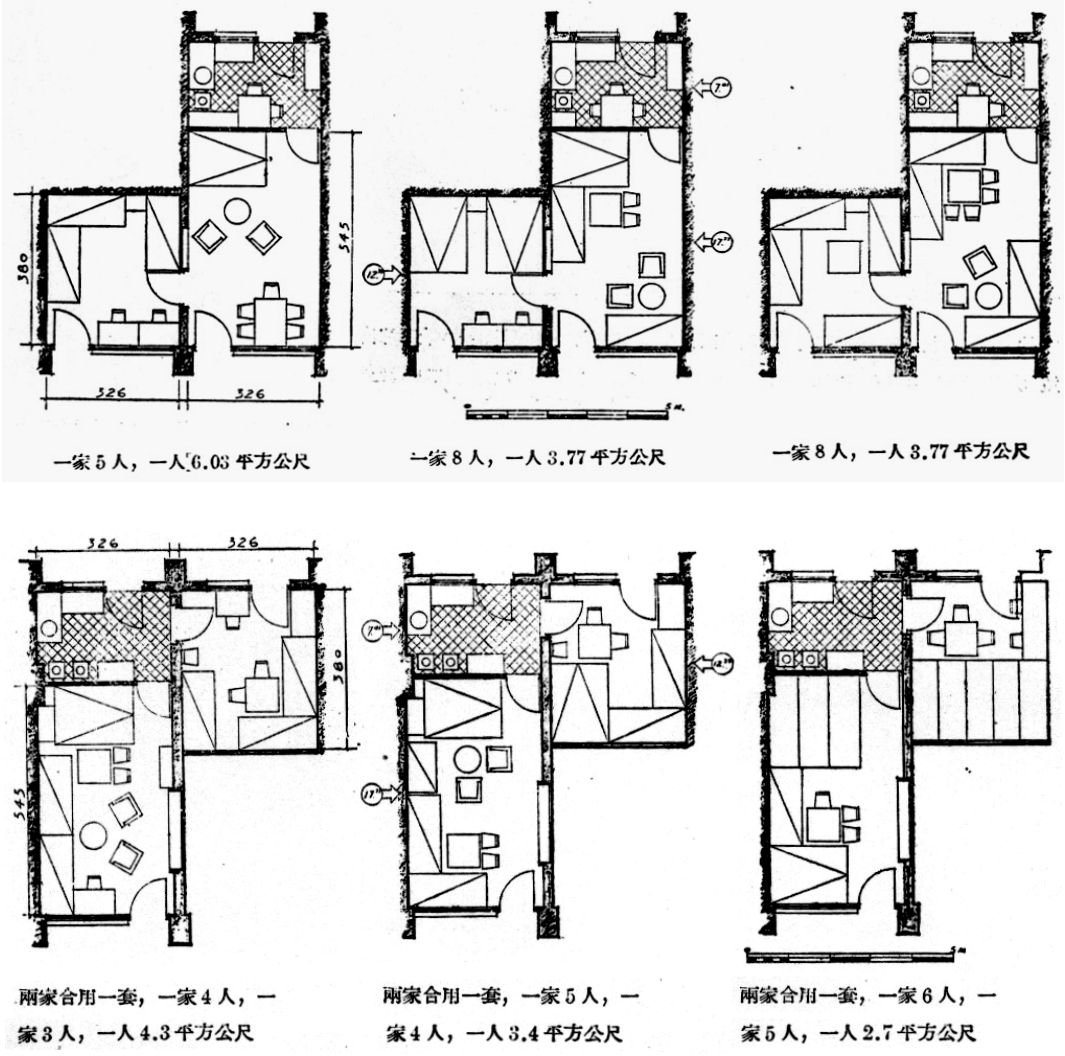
Apartment plans for different allocation, Youanmen residential block
